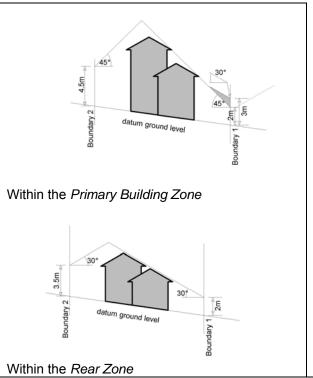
Typical building envelope - mid sized blocks approved before (commencement date) - except in Molonglo Valley
